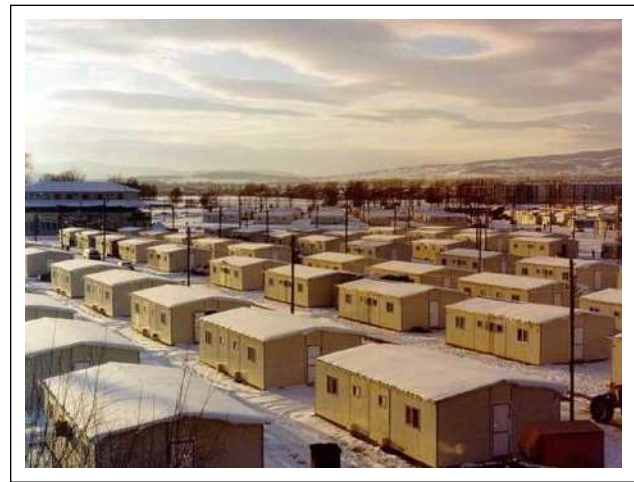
Prefabricated concrete was used to construct temporary shelters [5].
